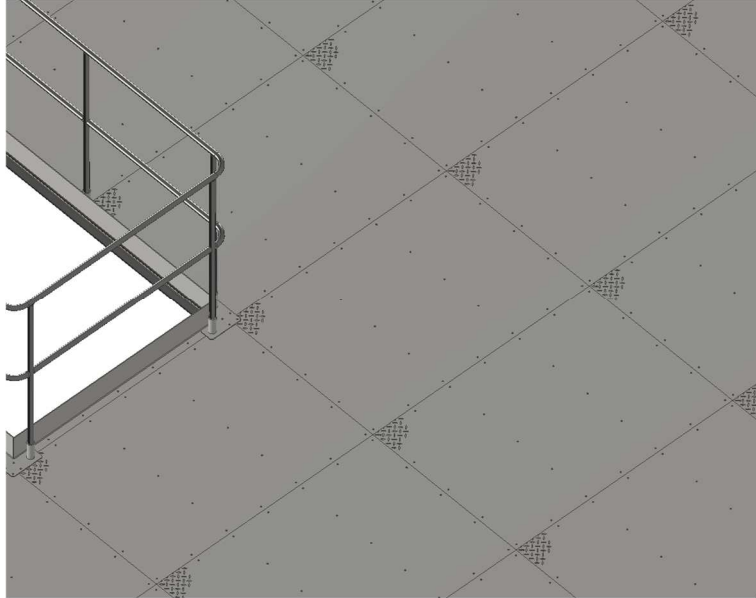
Platform floor made of bolted tread (checker) plates [2].
